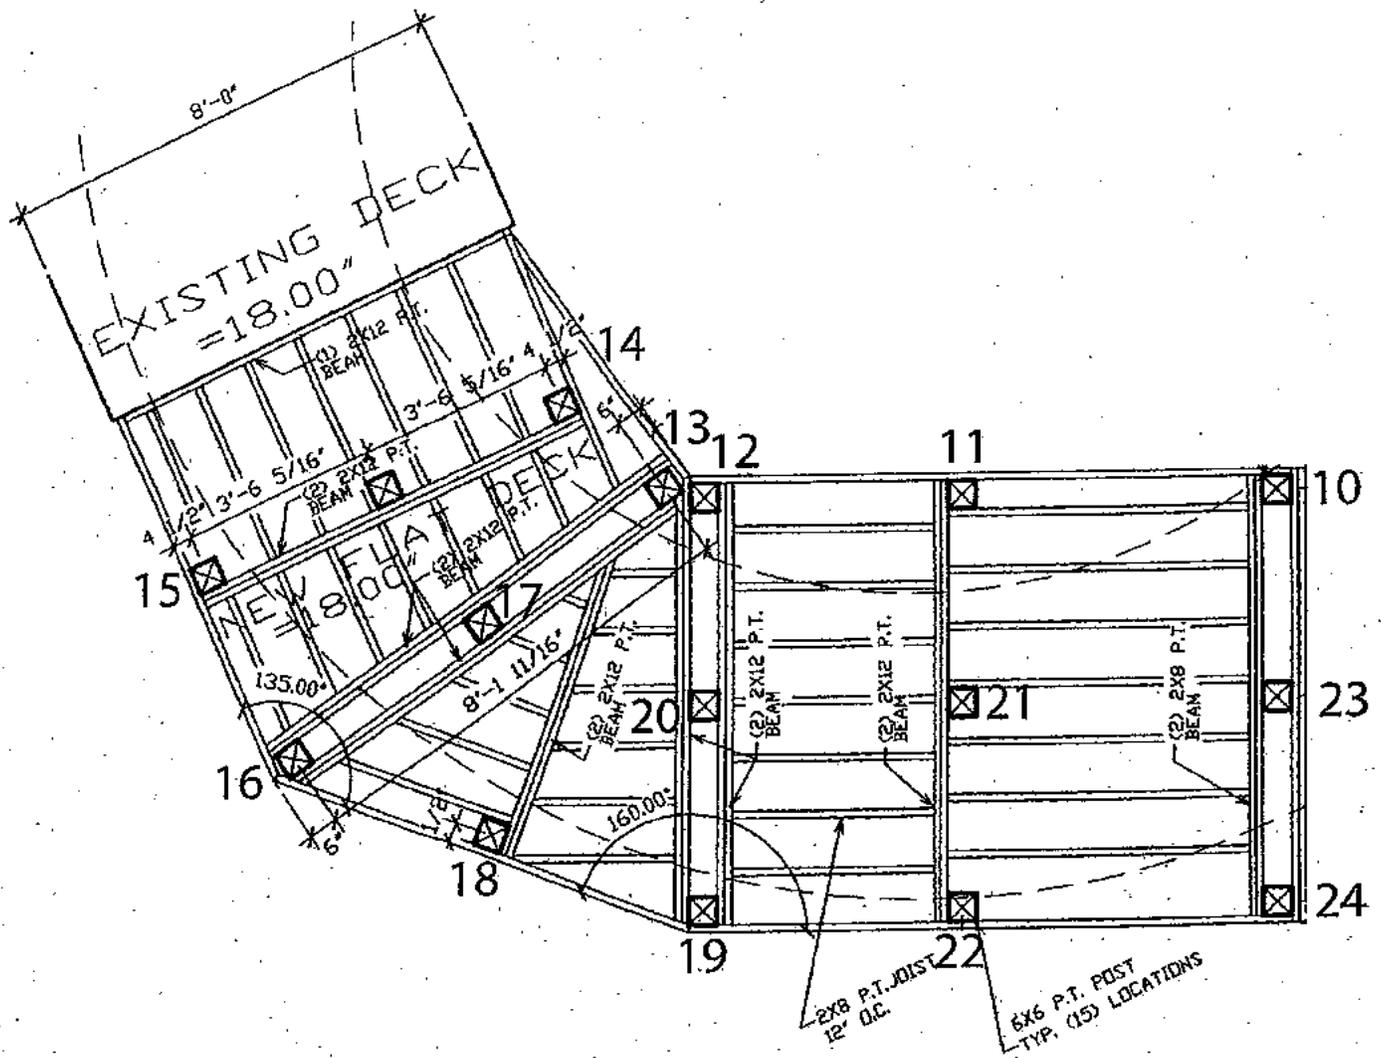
Plan of numbered postholes 10 through 24, Bridge B, West Ramp. These are the locations of Holes #10 through #24 in the northeastern side of the No Name Creek Midden (deck = bridge).
